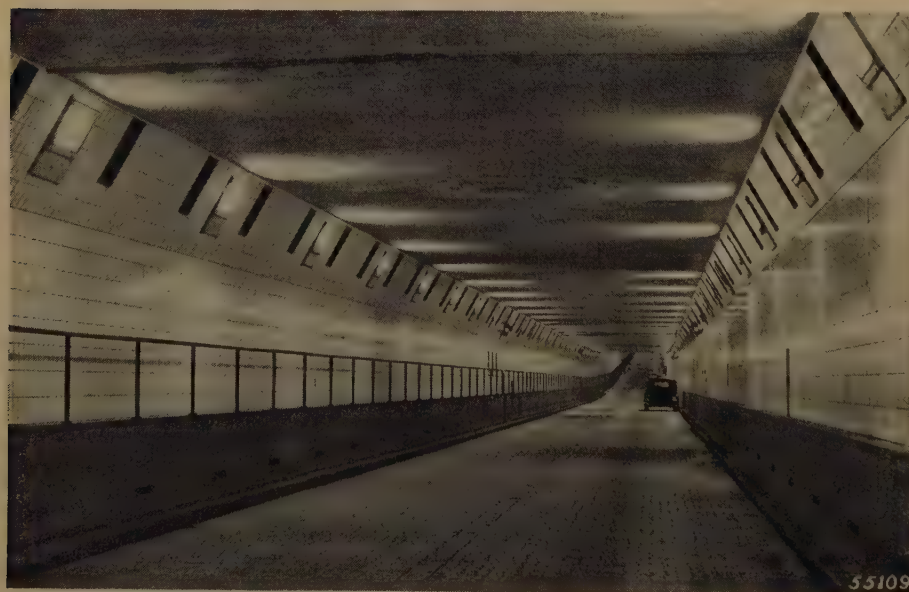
A view inside the traffic tunnel under the Meuse at Rotterdam, which was opened in 1942. To meet the requirements of fast traffic two tubes were built side by side 1072 metres long, each 7.5 metres wide and 4.2 metres high, with a road width of 6 metres. For the illumination Philips sodium lamps with a flux of 2500 lumen were used, installed in shallow ornaments fitted in niches in the upper half of the tunnel walls slanting forward. The distance between the light points is 6 metres. This illumination gives a brightness inside the tunnel of 3 c/m^2 .
